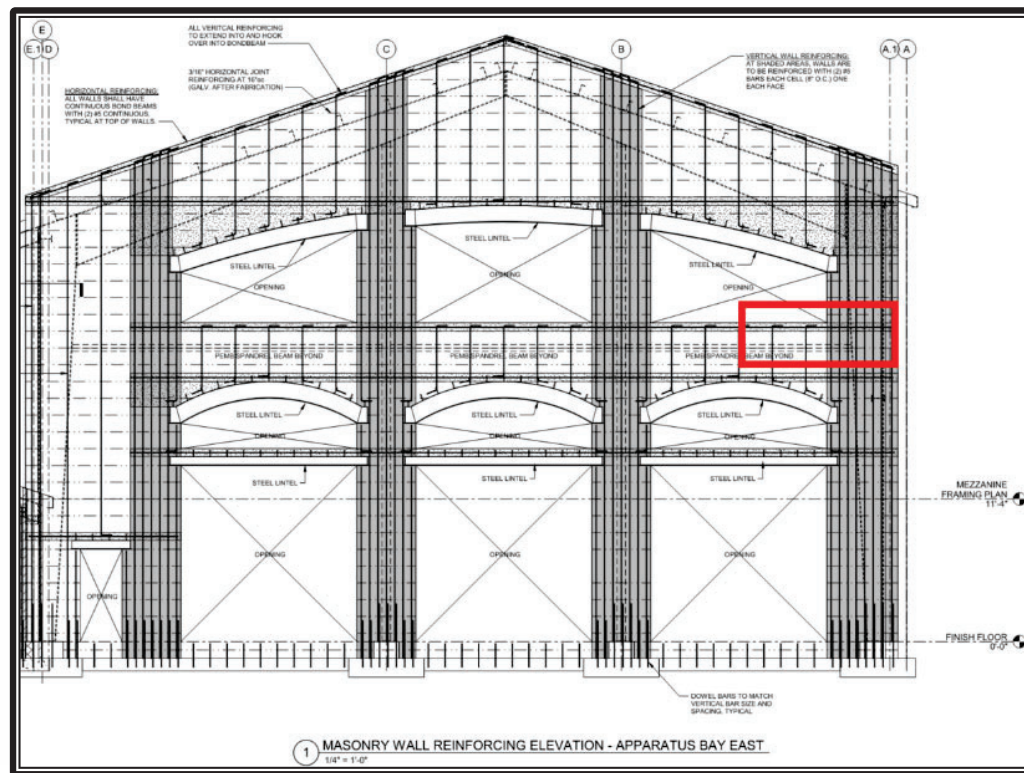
CMU wall elevation showing the approximate location of Test Area 4 (outlined) (cropped plan courtesy of T&V).
